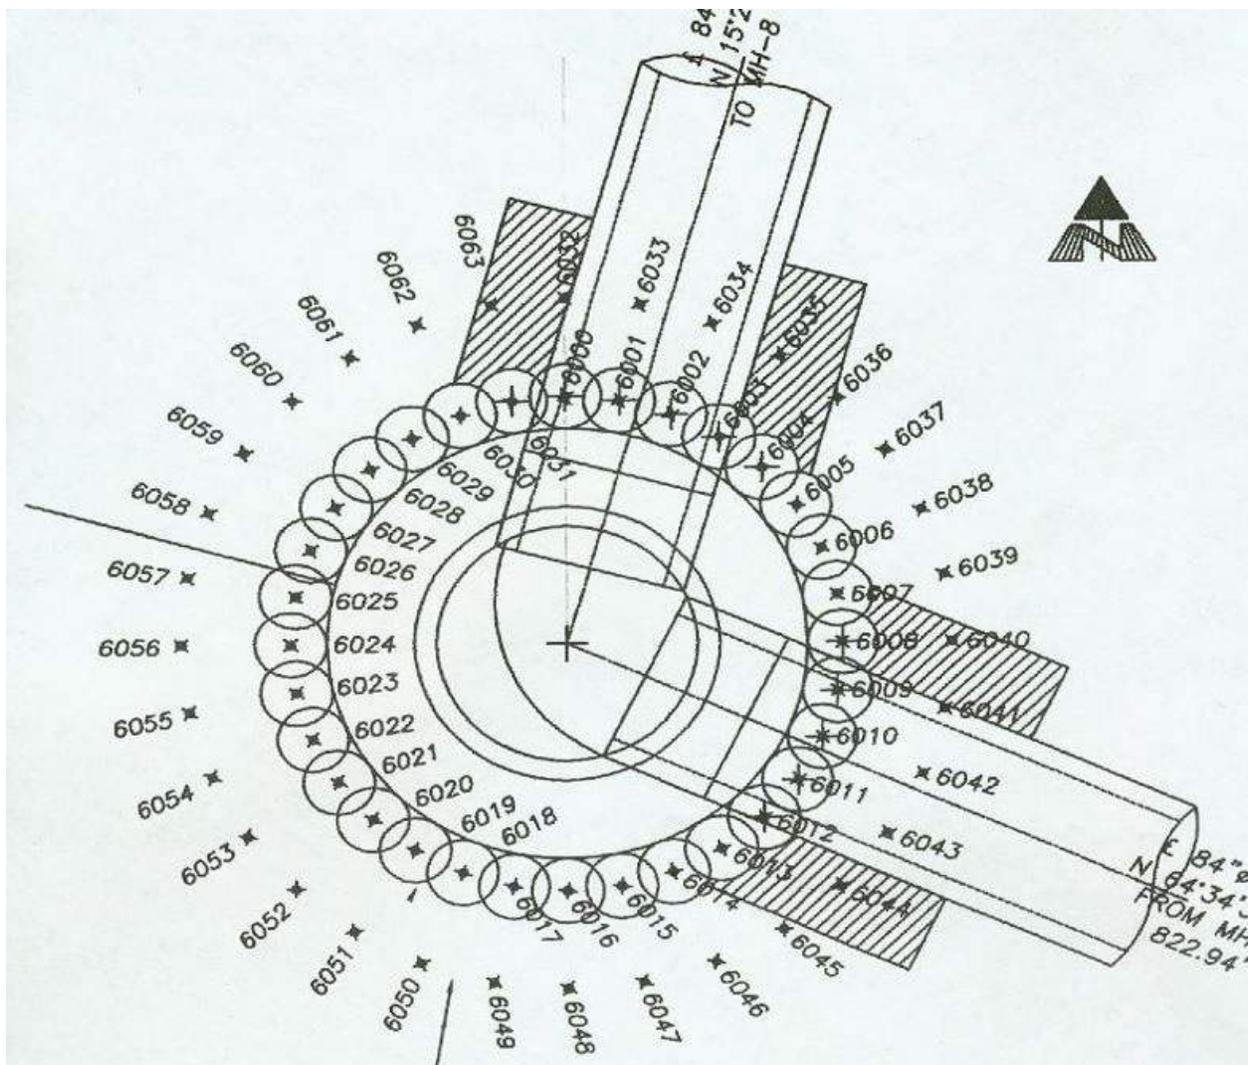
Typical secant pile shaft layout with overlapping concrete secant piles
